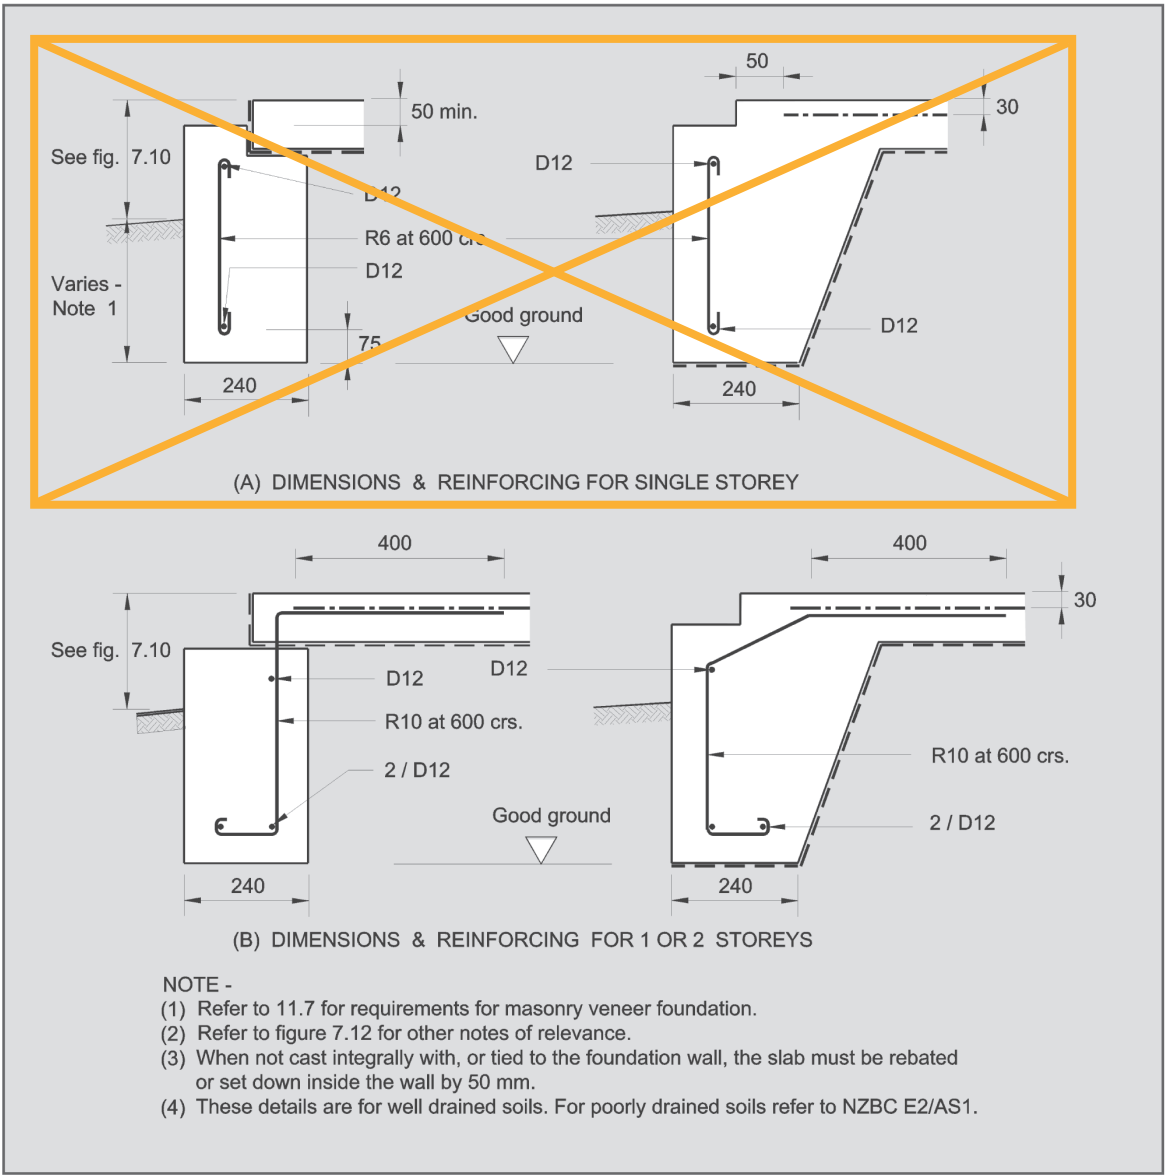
Masonry veneer foundation edge details –*In situ* concrete (see 7.5.2.3 and 11.7)
